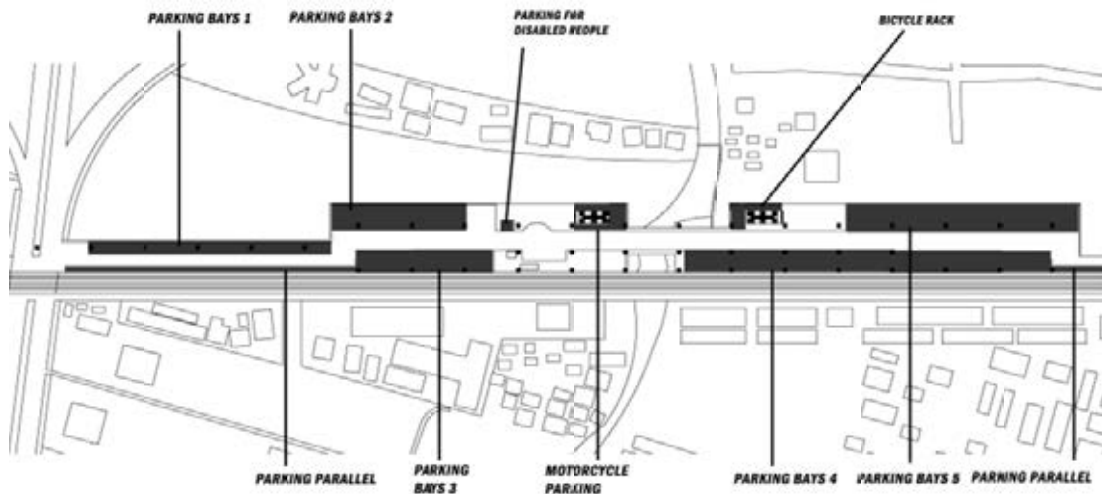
Parking bays facility and parallel parking around *Hua Mak* ARL station currently
